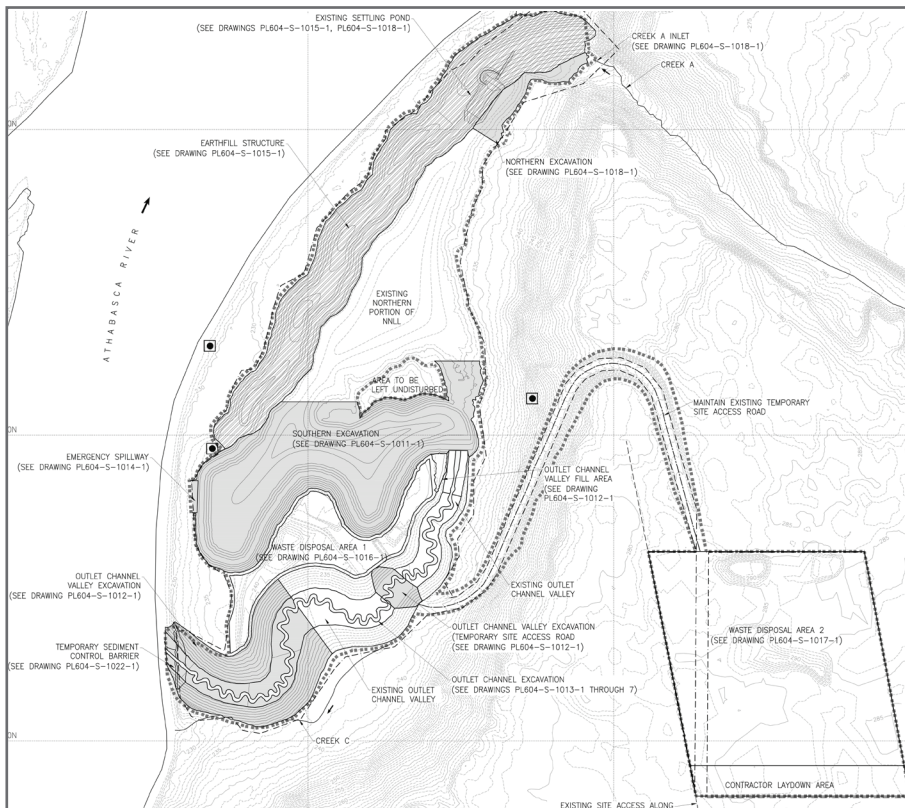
Issued for Construction plan view of the NNLL, Golder 2012.
